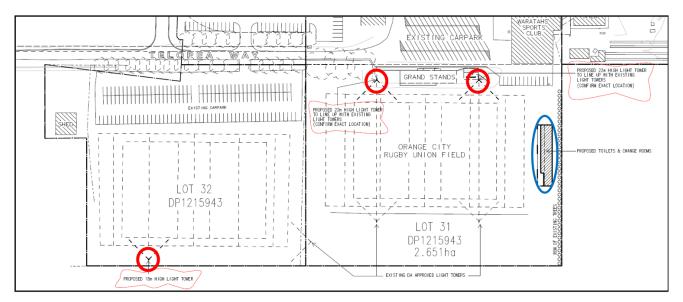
proposed site layout showing proposed new light towers (Red Circles) and new amenities building (Blue Circle)
